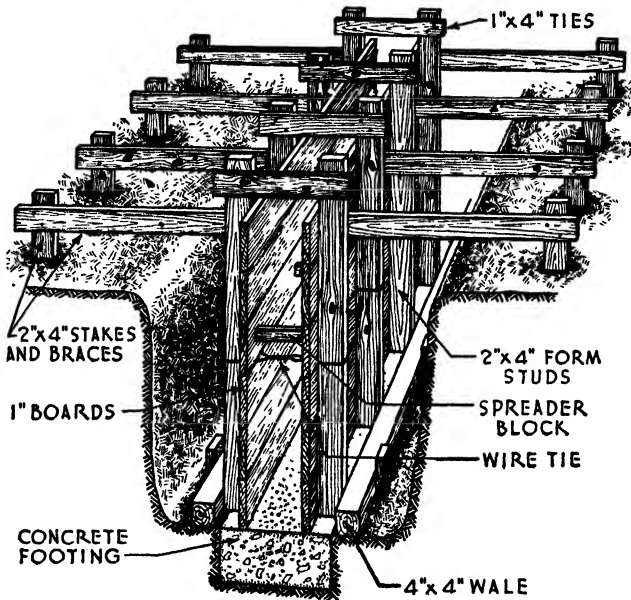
A good method of making foundation forms when footings are required. (Portland Cement Association)
